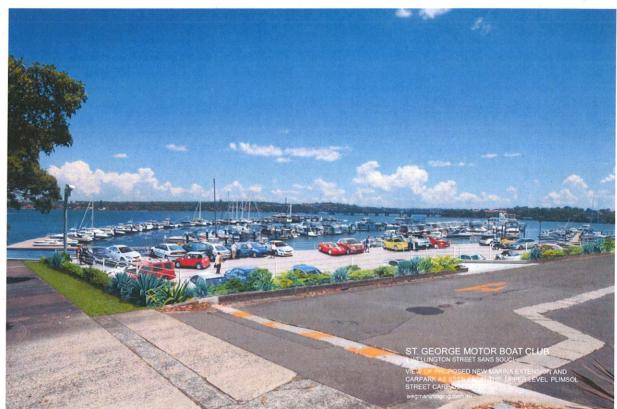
Photomontage of the proposed car parking structure and new marina arm (Source: Proponent's PPR)
